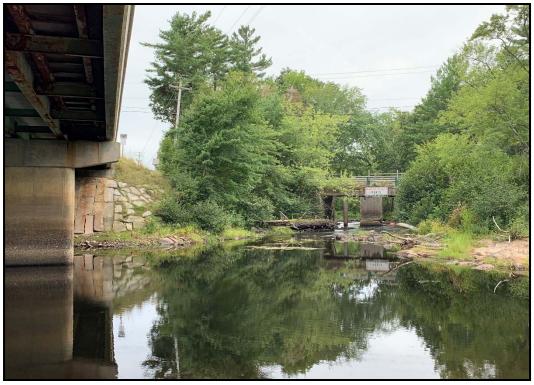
View of southern bank of Suncook River downstream of existing bridge crossing. 9/6/2019.
